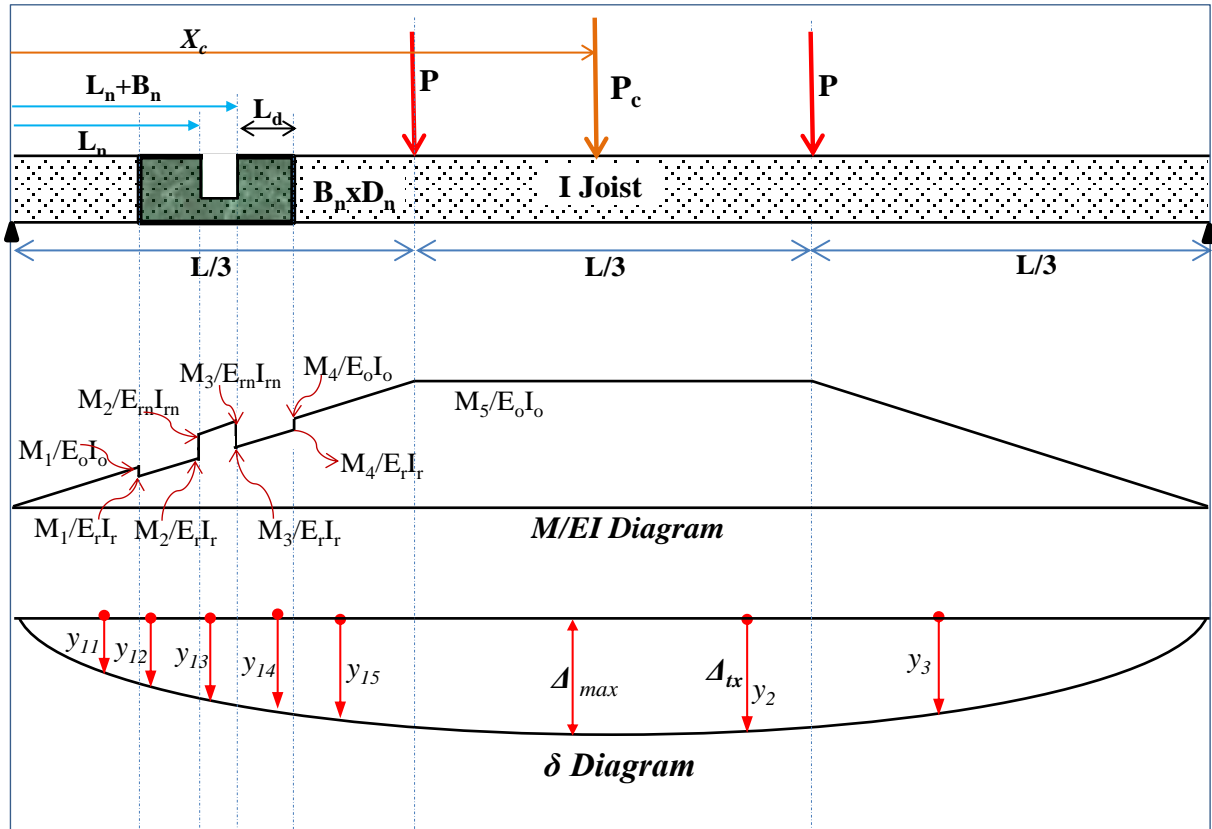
Loading and Support Condition of Retrofitted Flange Notch I-Joists
